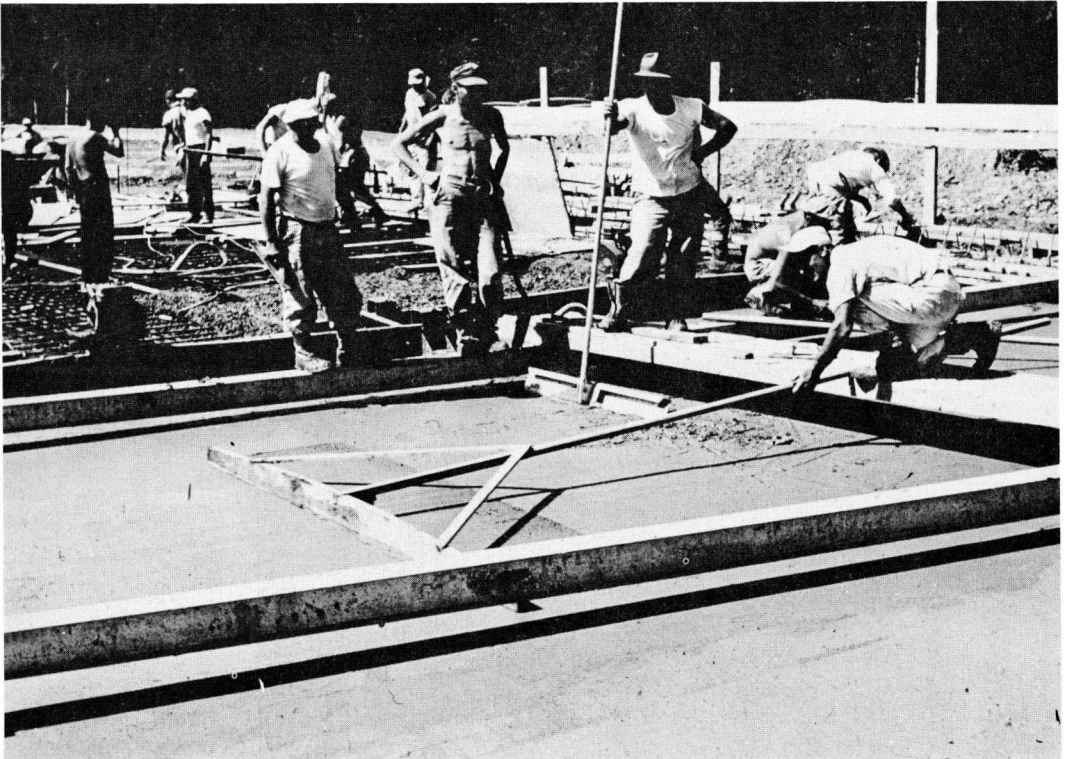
Work bridges may be required to avoid walking in the concrete after screeding.
